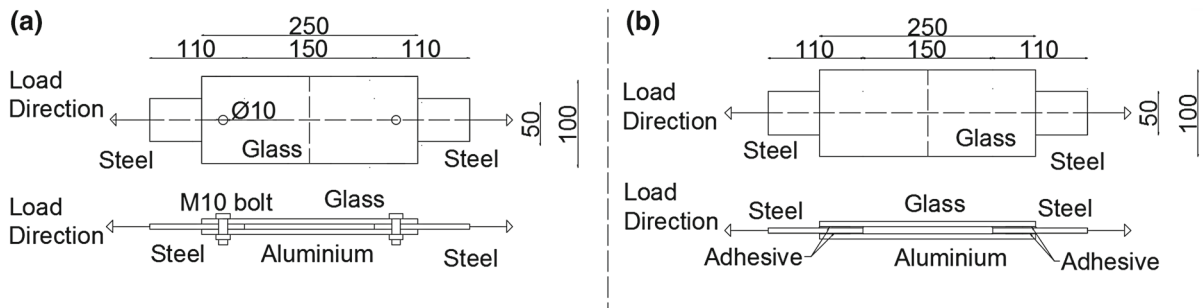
Sketches for the tensile tests for bolted (a) and adhesive (b) joints (dimension in mm). Symmetry planes of the joints are indicated by the dashed lines
